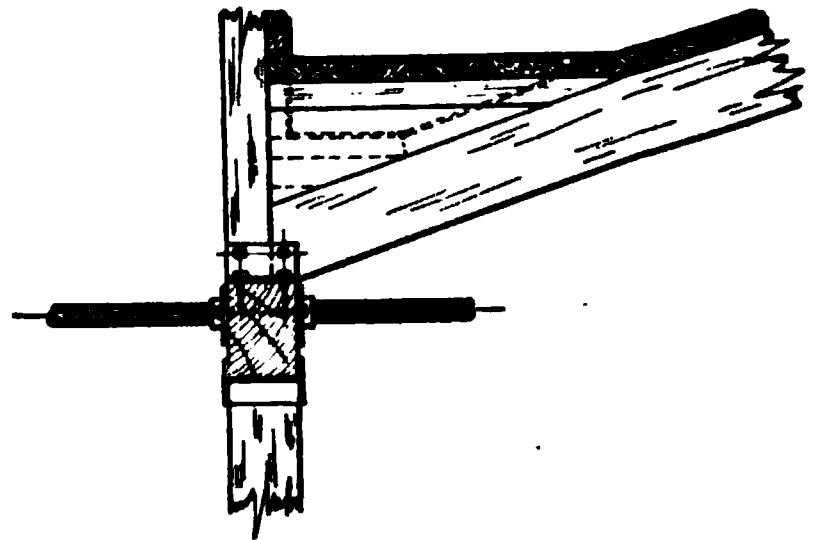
Detail of saw-tooth frame—vertical face with pipe ties.
